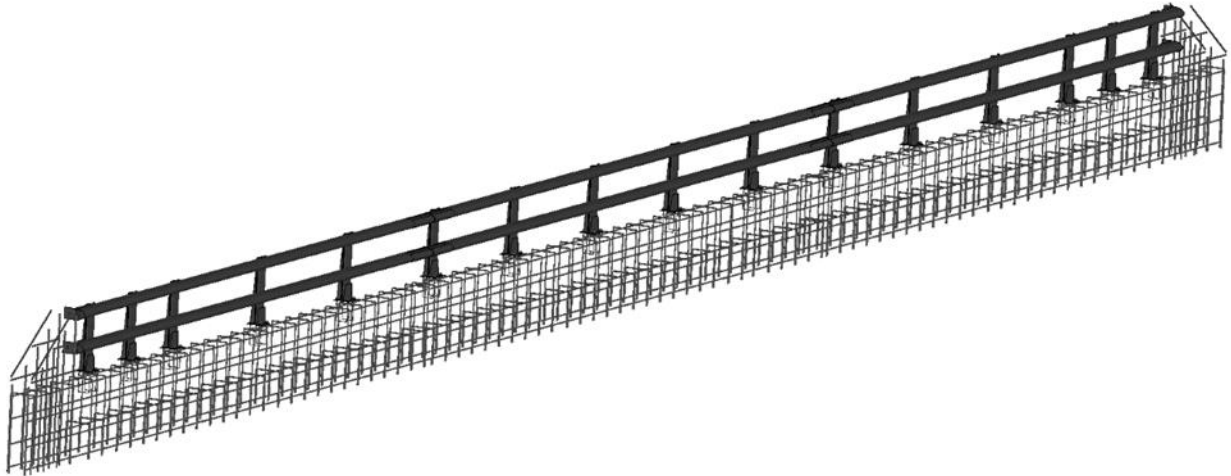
Steel reinforcement bars in the concrete parapet of 2BMR.
